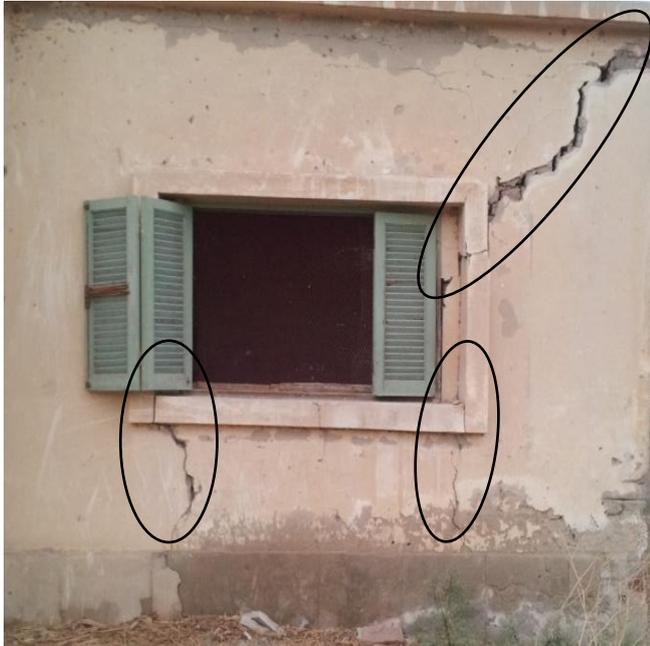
Diagonal cracks over lintel and vertical cracks below window opening (Old building in elhagar city, El.fayoum)
